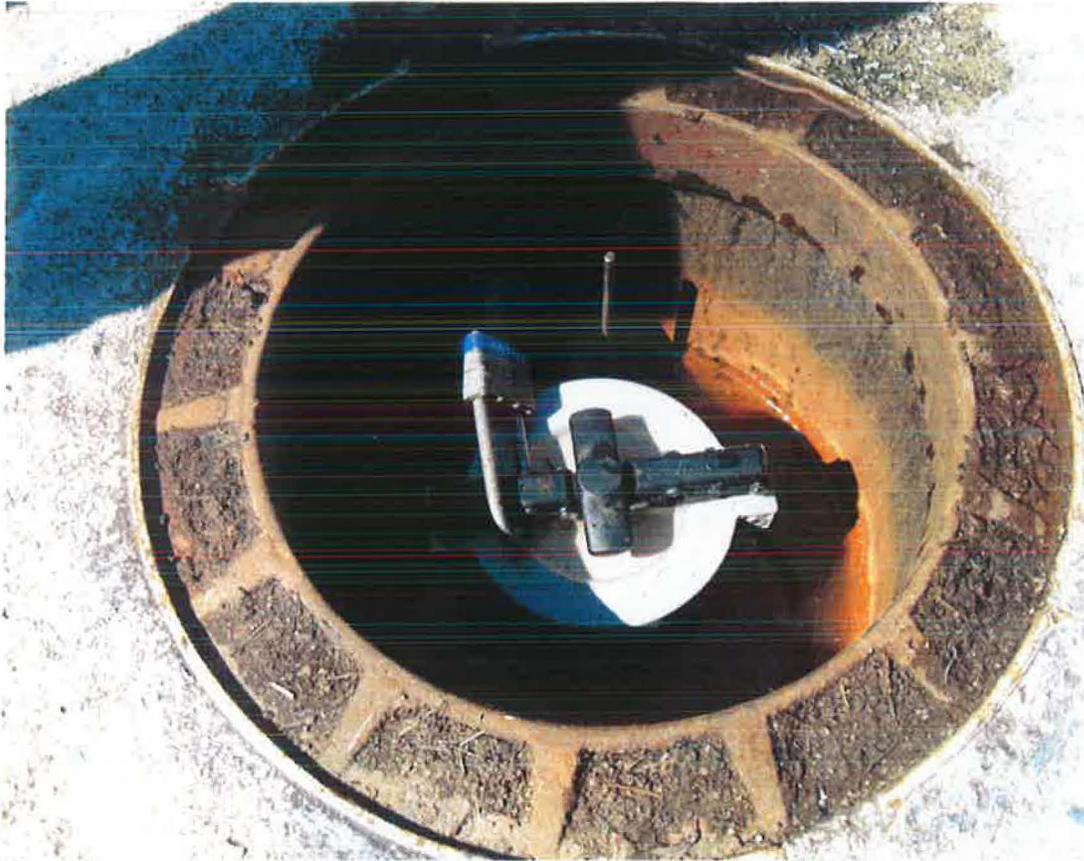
Tank 1 fill port with spill bucket containing liquid. The fill port was locked but later opened. The EPA inspectors visually confirmed a flapper valve in the fill pipe.
